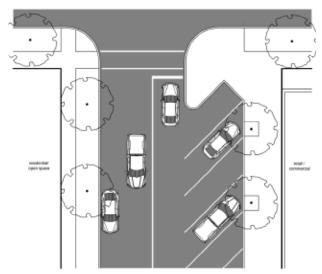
(1). Typical Major Local Urban Street A with Parking on one side.
